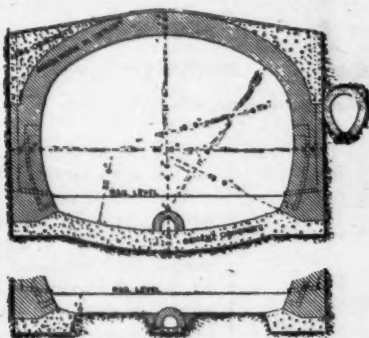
TRANSVERSE SECTION OF COVERED WAY No. 1 AND 2, WITH AND WITHOUT INVERT.
